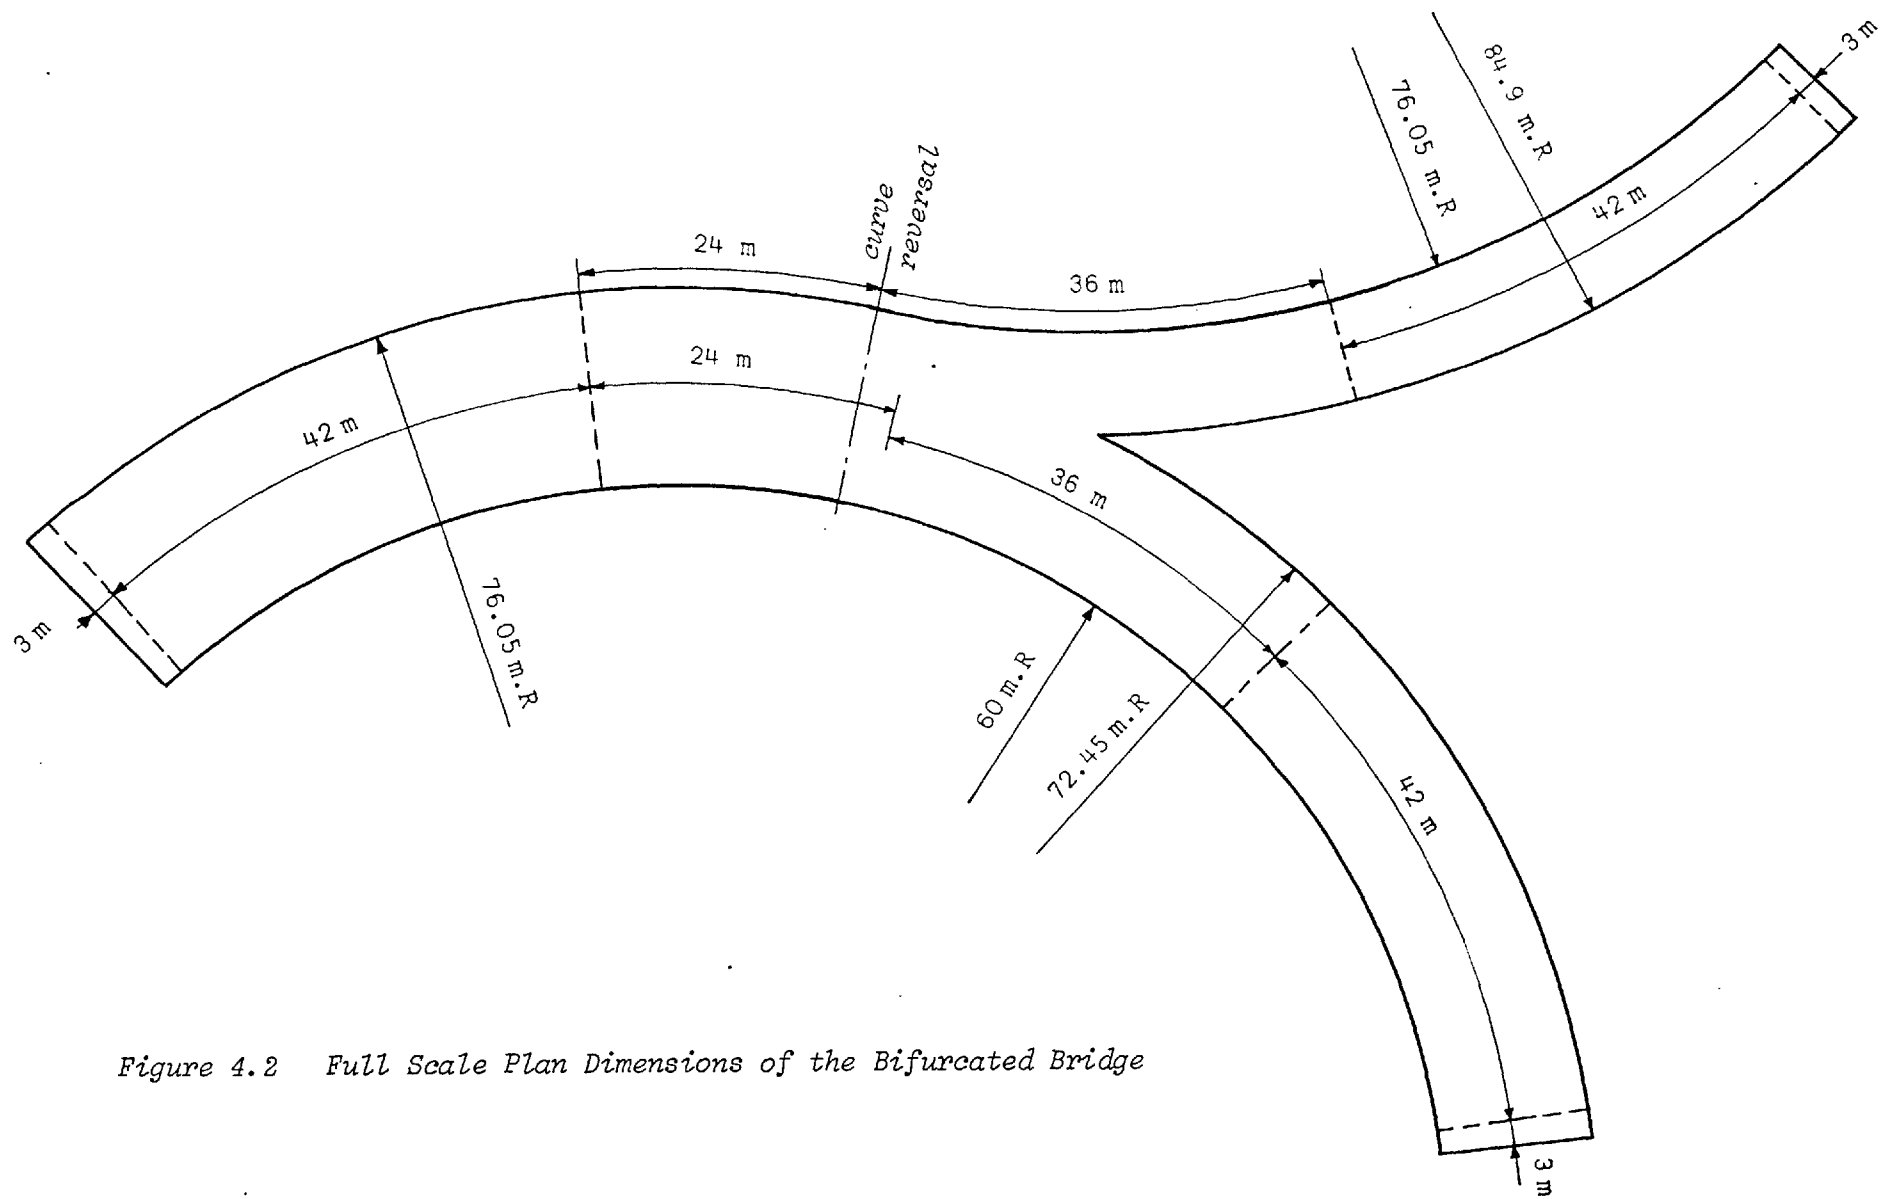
Full Scale Plan Dimensions of the Bifurcated Bridge
